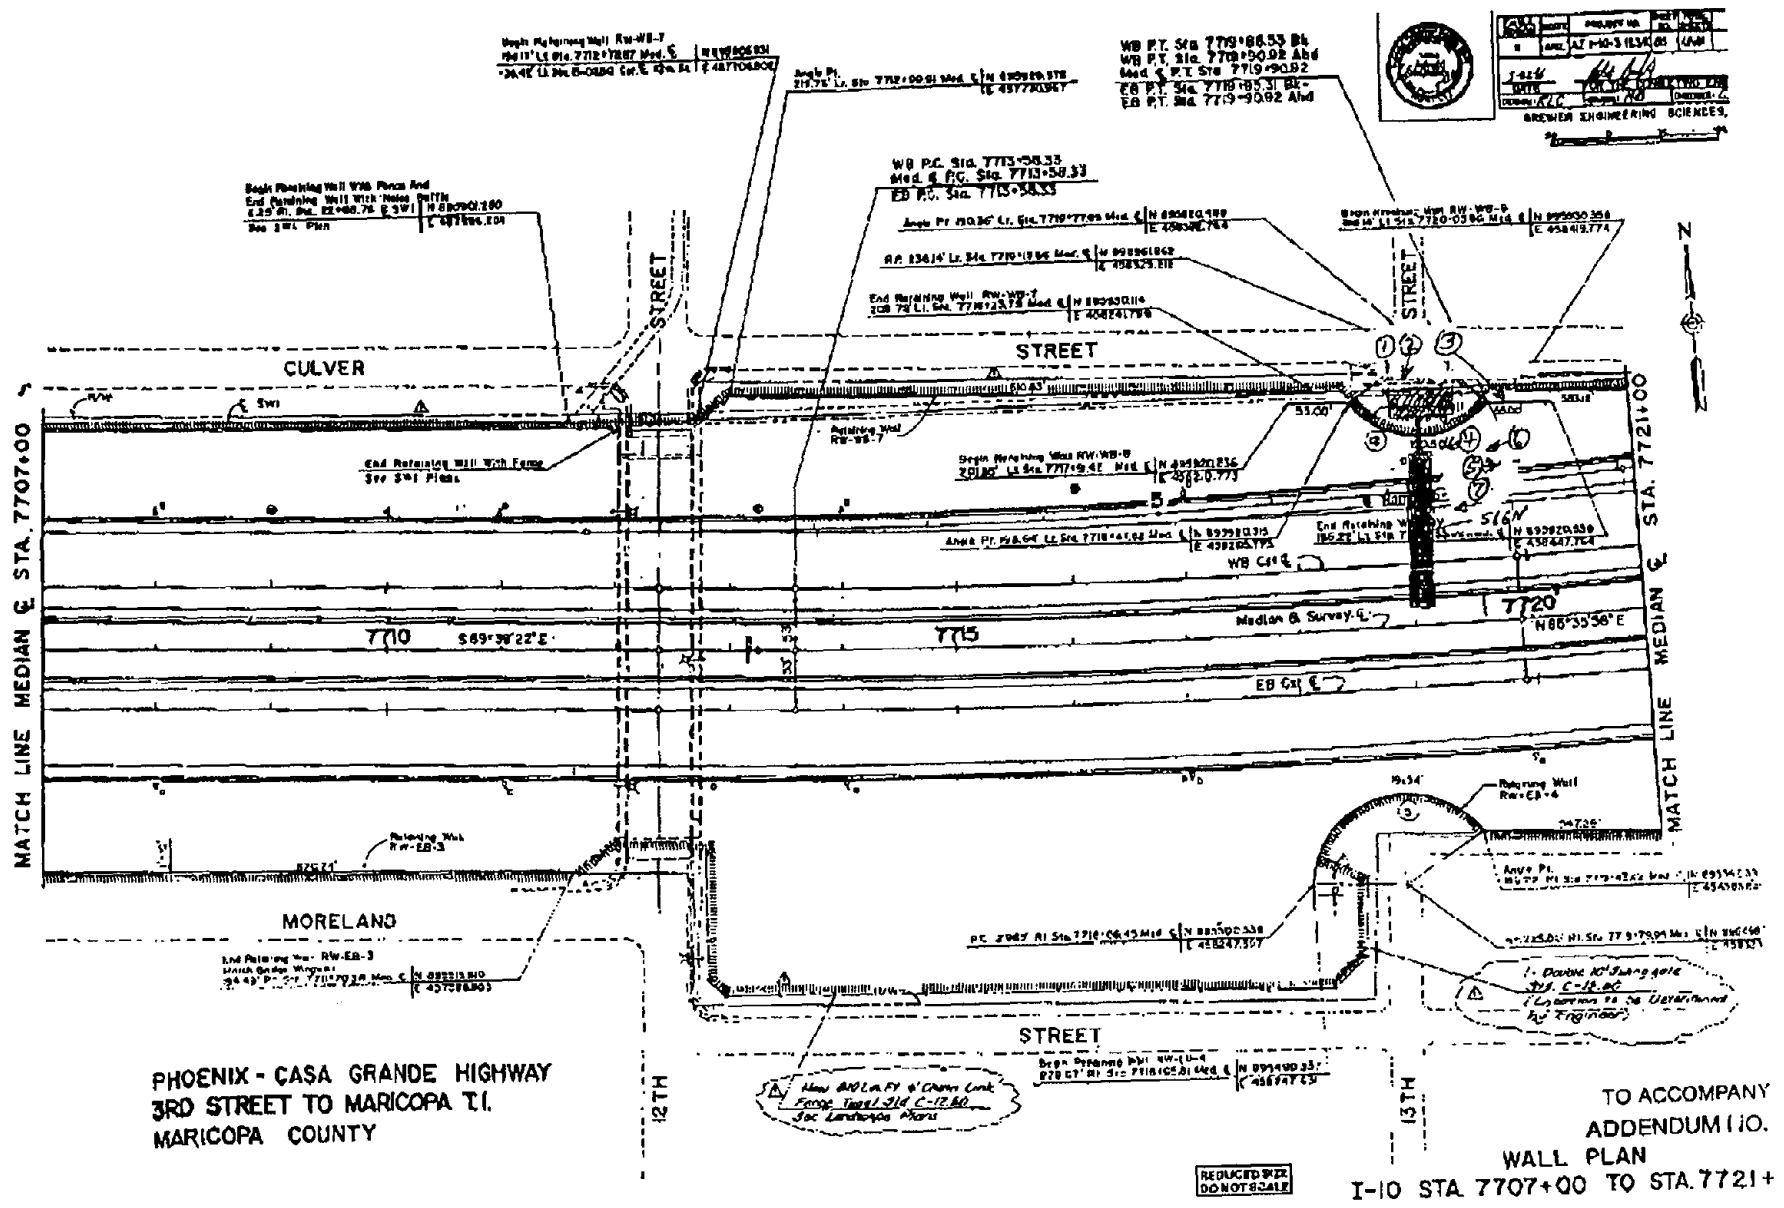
Plan-View Drawing for I-10 Freeway Near Thirteenth Street Showing Location of Sign Bridge
